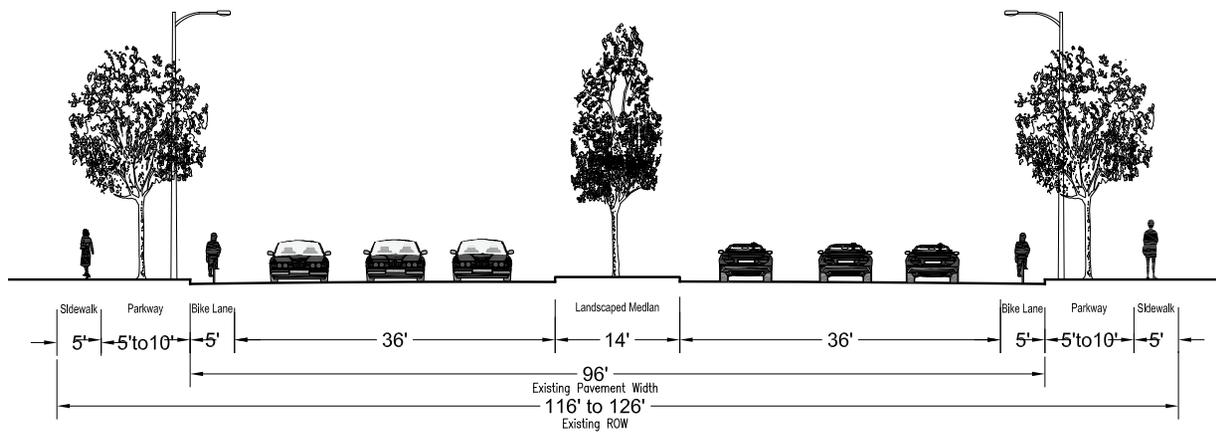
TYPICAL SECTION - MILLIKEN AVENUE
